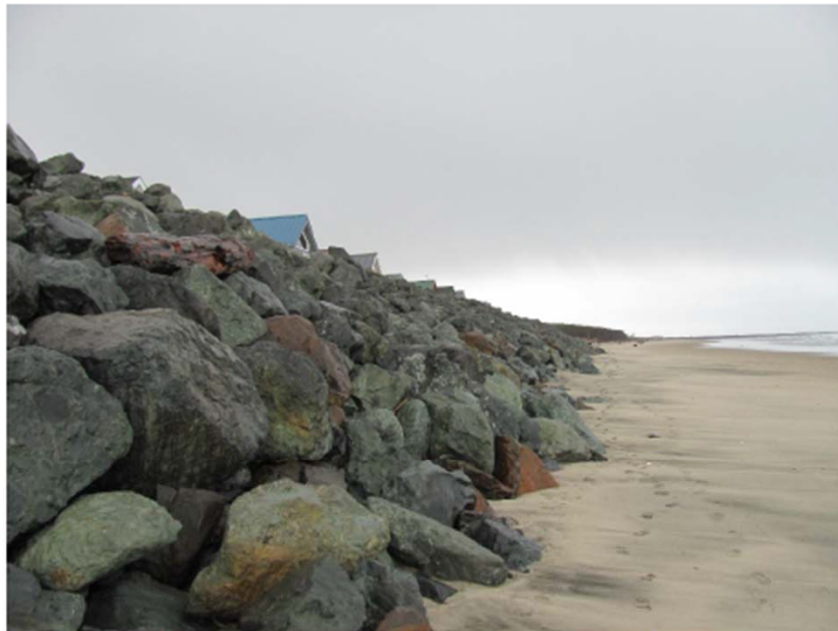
Looking south at the rock revetment at the Shoreline RV Park located about 900 feet north of the Pine Beach subdivision.
